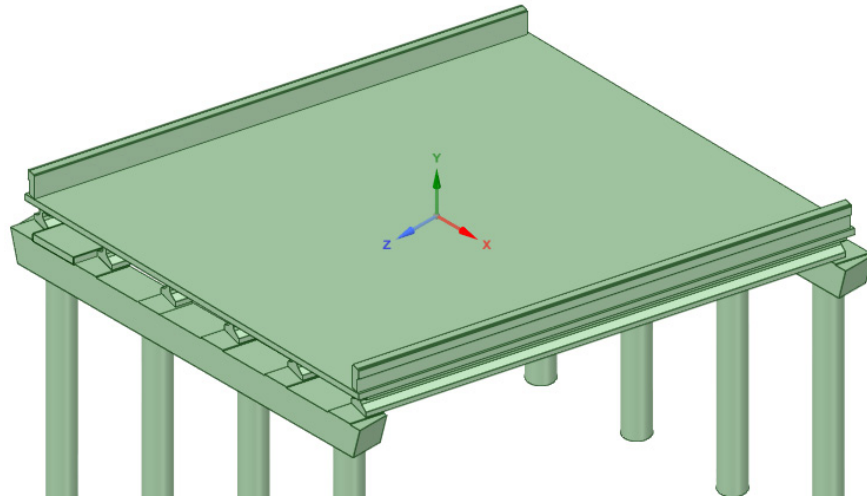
15-degree skew, 44-ft roadway TX28 I-girder bridge
